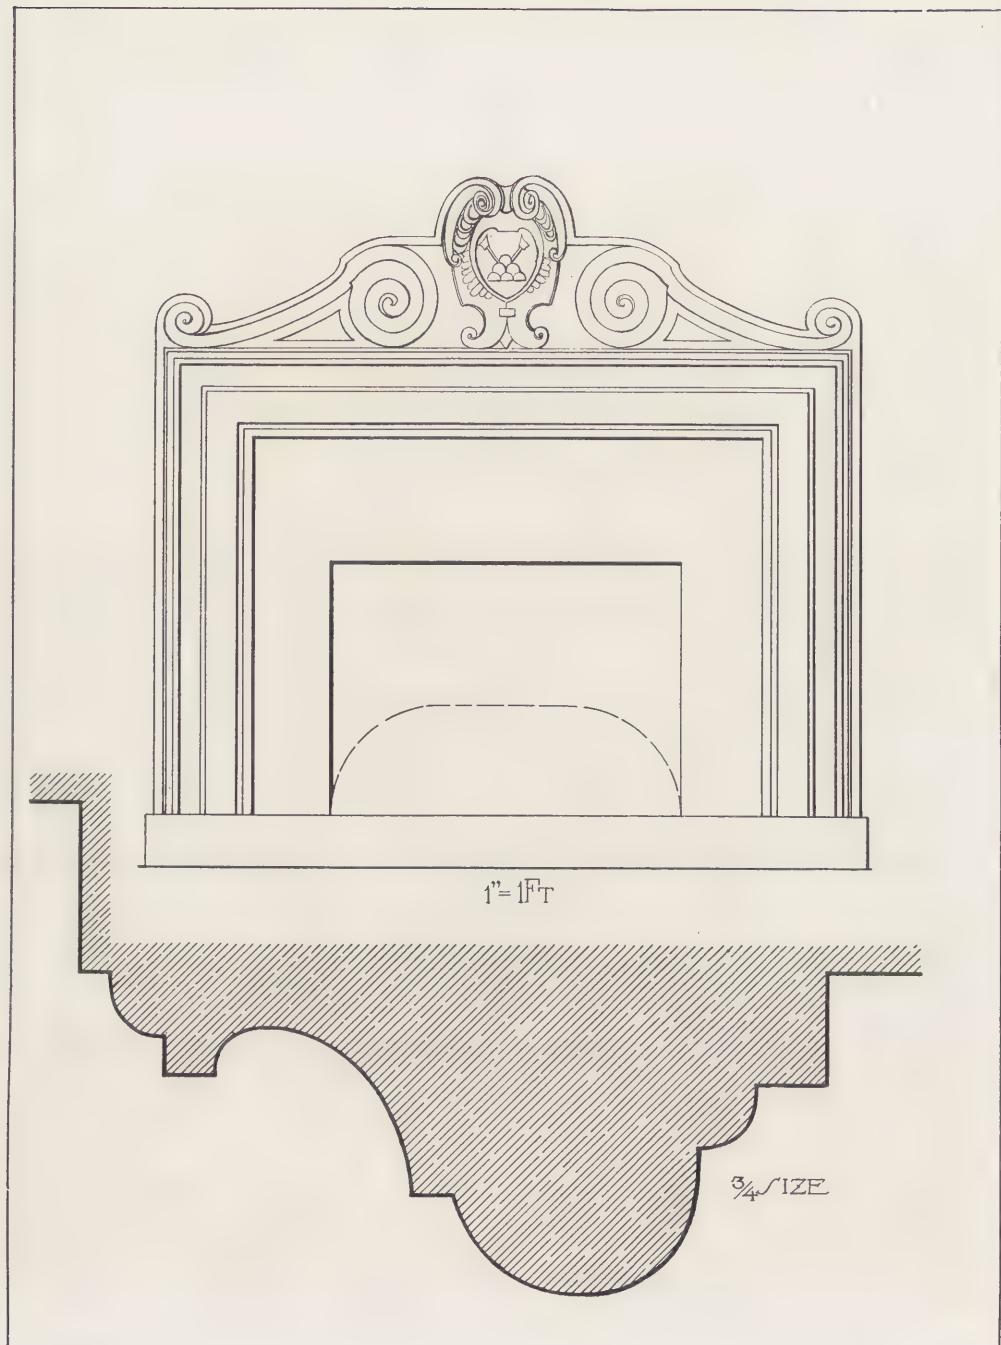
DETAIL OF FIREPLACE—BEDROOM, LA PIETRA, FLORENCE.
